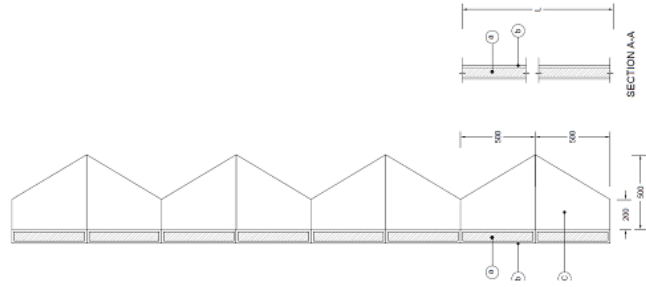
(Example) Cross-section through noise barrier (Dimensions in millimetres). g: mineral wool; b: 1 mm thick blind steel sheet; c: 1 mm thick front perforated steel sheet.
